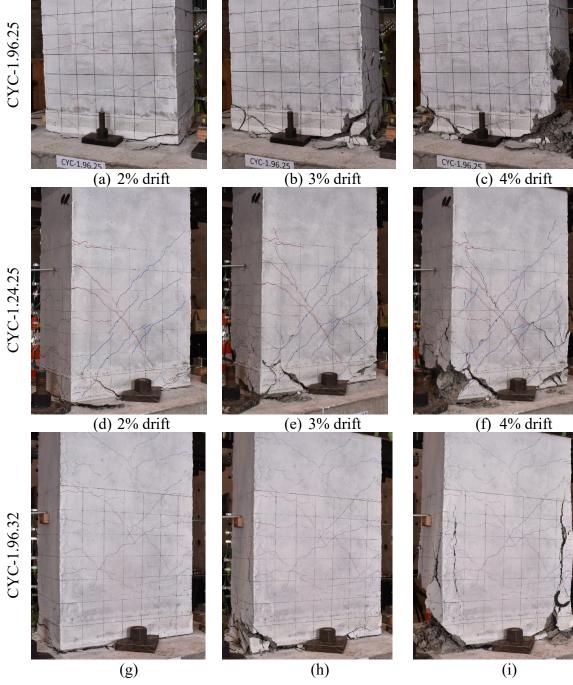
Damage progression in Specimen CYC-1.96.25, CYC-1.24.25 and CYC-1.96.32
